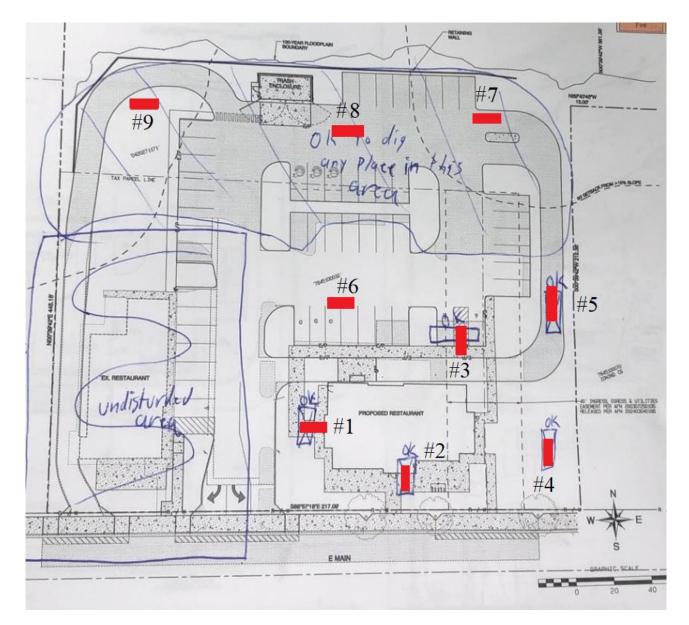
Plan of property showing trench locations, Trenches #1-#9.
